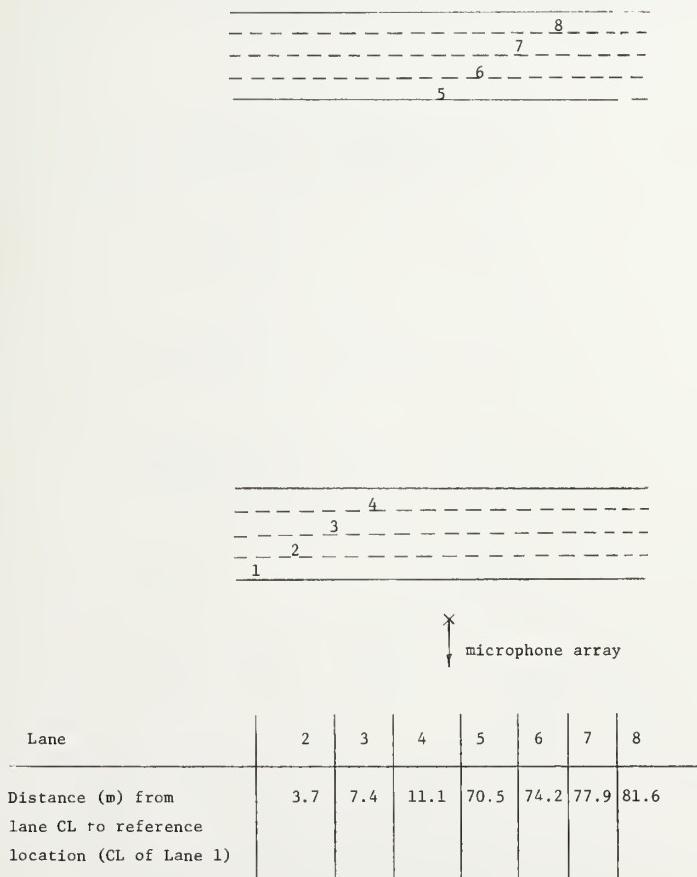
Plan view of I95 test site: eight lanes of concrete with 3.2 m paved outer shoulders, 3 m inner shoulders and grass median.
